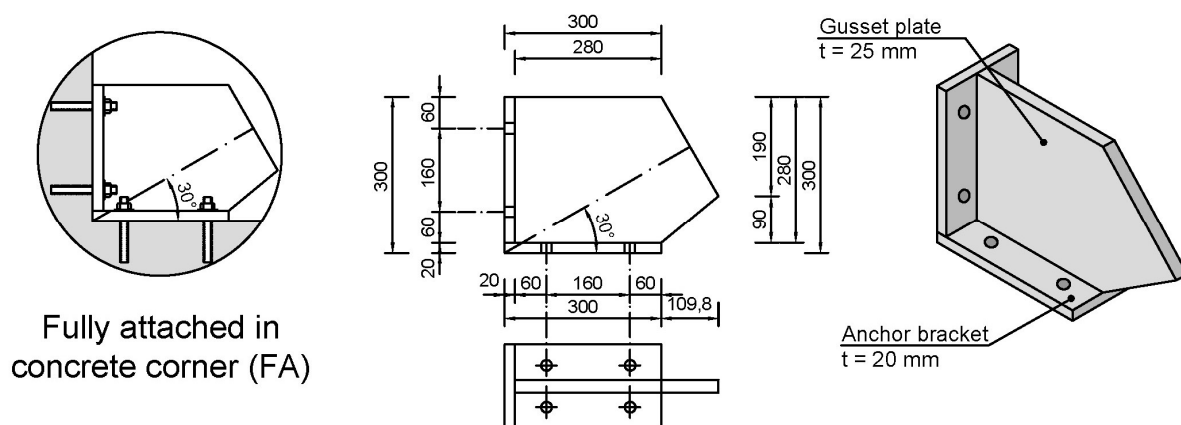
Dimensions of the bracket-to-gusset plate connection element for fastening of steel braces at an angle of 30° considered in the numerical study. (Note: All dimensions are in mm).
